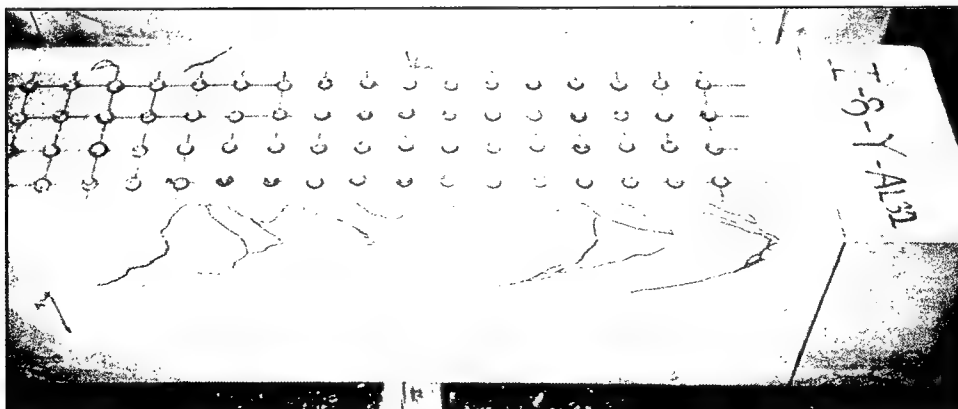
Initial cracking in I-8-Y-AL32 caused by the attachment of the strip
